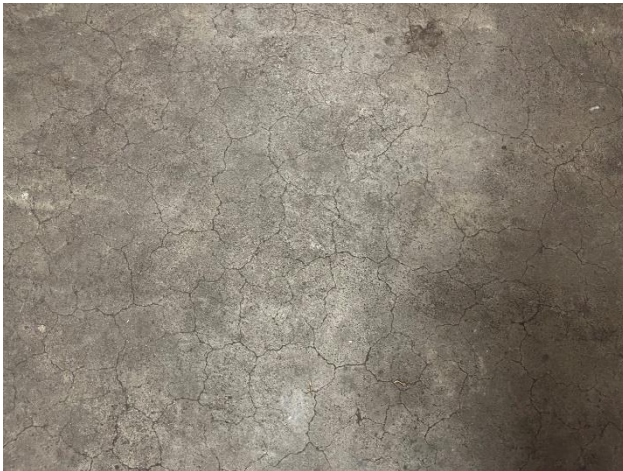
Non-original flooring systems include the concrete flooring located at the north annex.
